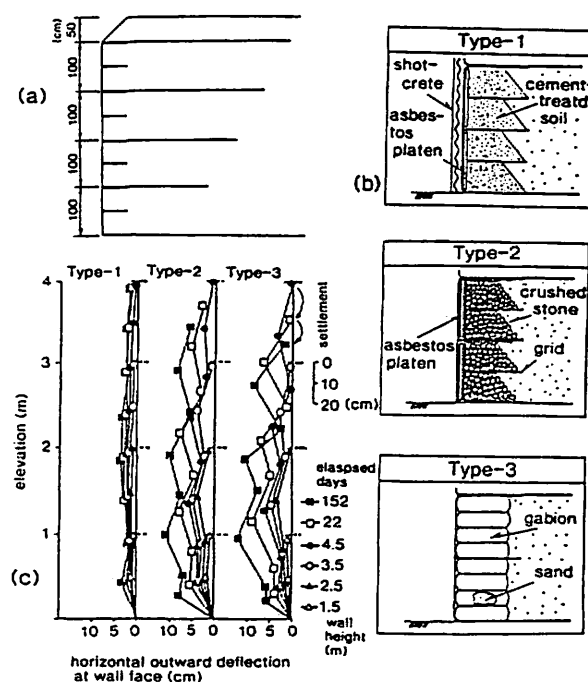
Long-term observations of three GRS-RWs having different types of facing; (a) wall configurations, (b) facing types and (c) the displacement at the wall face (Nakane et al., 1990).
